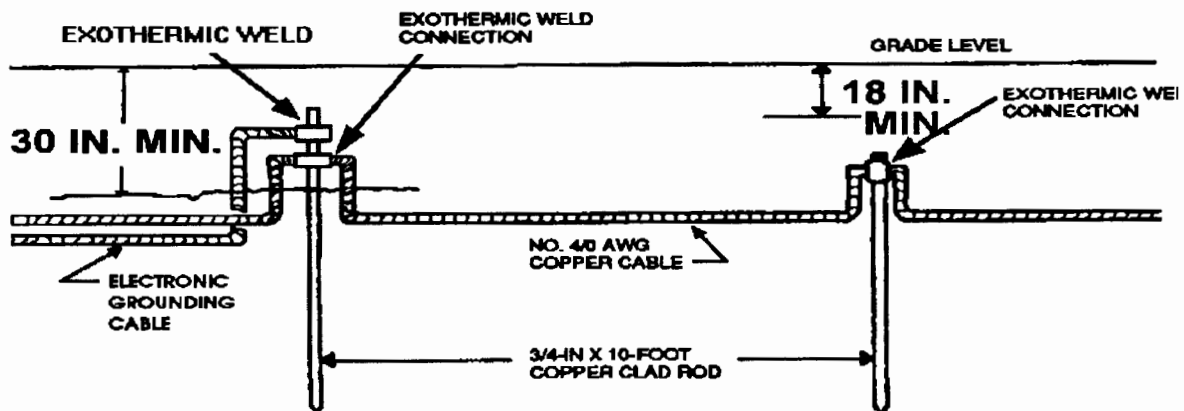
DETAILS OF GROUND ROD/COUNTERPOISE INSTALLATION
